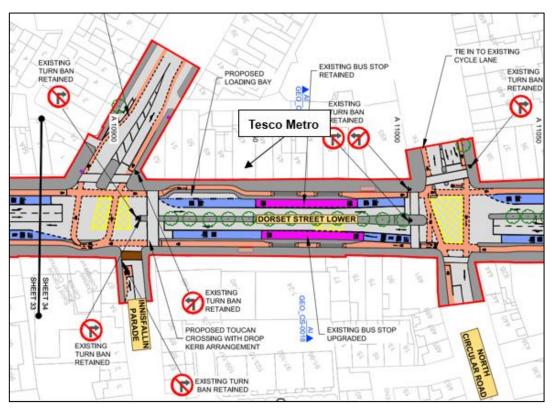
General Arrangement of Proposed Scheme at Tesco Metro, Dorset Street Lower (Sheet 34)
